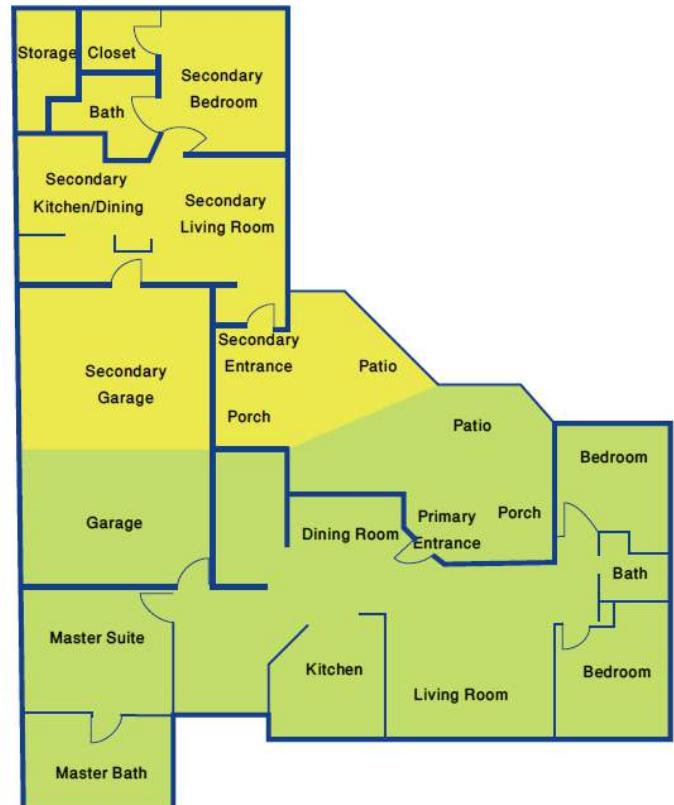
L Shaped MGH plan with possibility for garage space to be converted to living space
